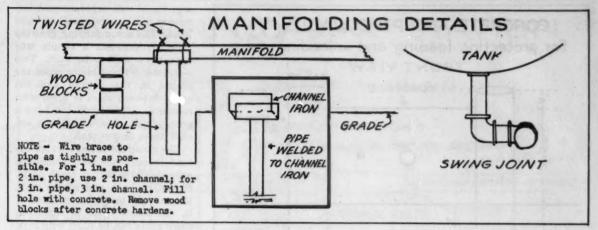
Shown here are the methods of fabricating and installing pipe supports and a close-up of a swing joint.
